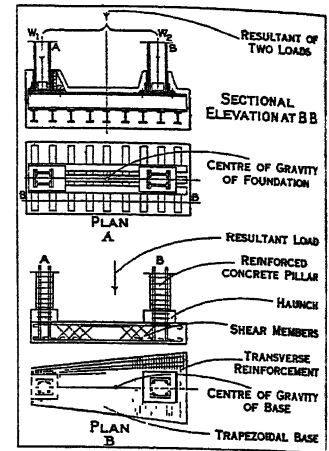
SPECIAL FOUNDATIONS (A) Compound steel grillage foundation, parallel base; (B) Compound reinforced concrete foundation, trapezoidal base. These methods are applicable where projection beyond the external pillar (A) is strictly limited
